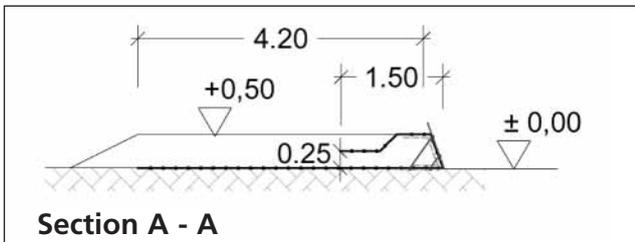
Cross-section A-A through the "Steep reinforced soil slope" field test earthworks
